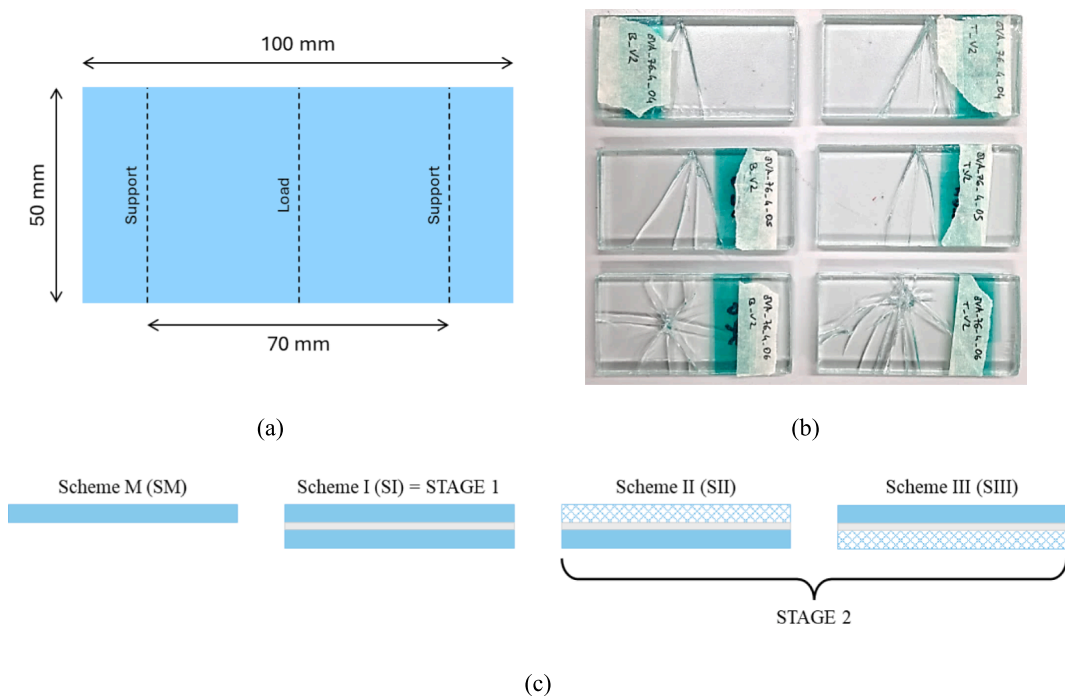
Quasi-static bending tests on partially fractured AN laminated glass specimens: (a) specimen size and setup, (b) examples of pre-cracked samples (top/bottom view) and (c) cross-section of the considered configurations (pattern = broken layer).
